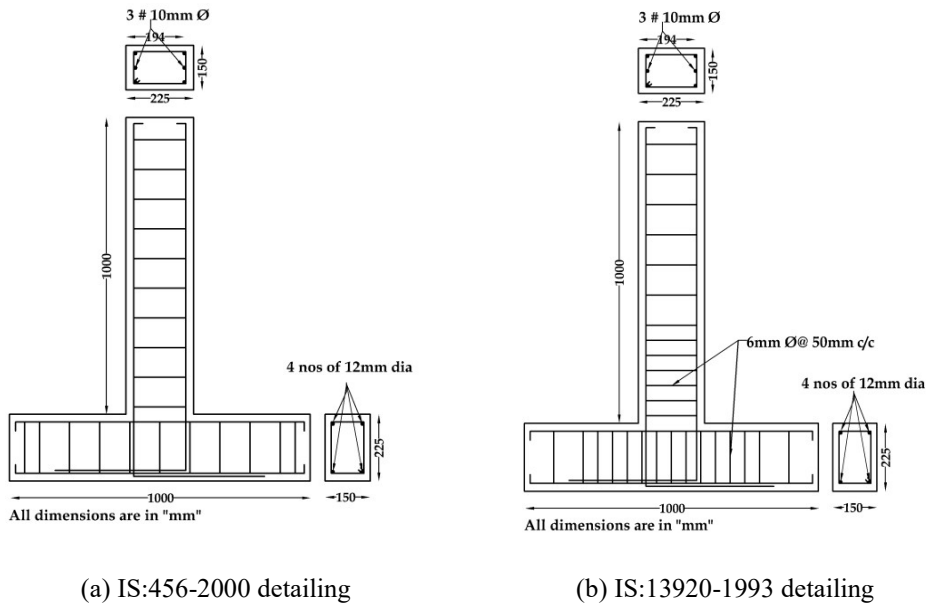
beam-column joint reinforcement detailing of (a) HYJ 1 (b) HYJ 2
